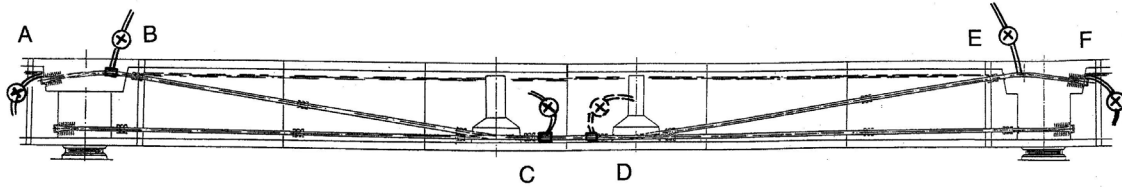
Grouting procedure for interior spans of Span-By-Span Bridges
